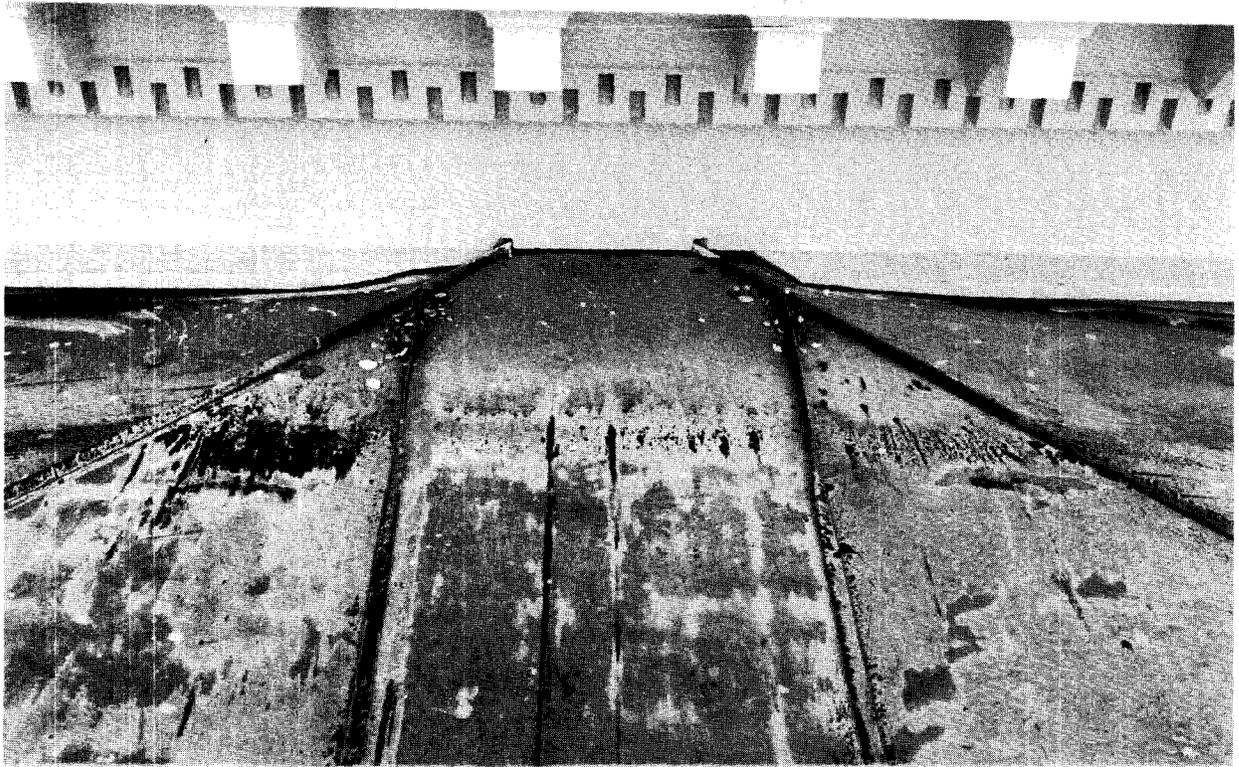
Penniman House: Hipped Roof of West Portico (1984).
